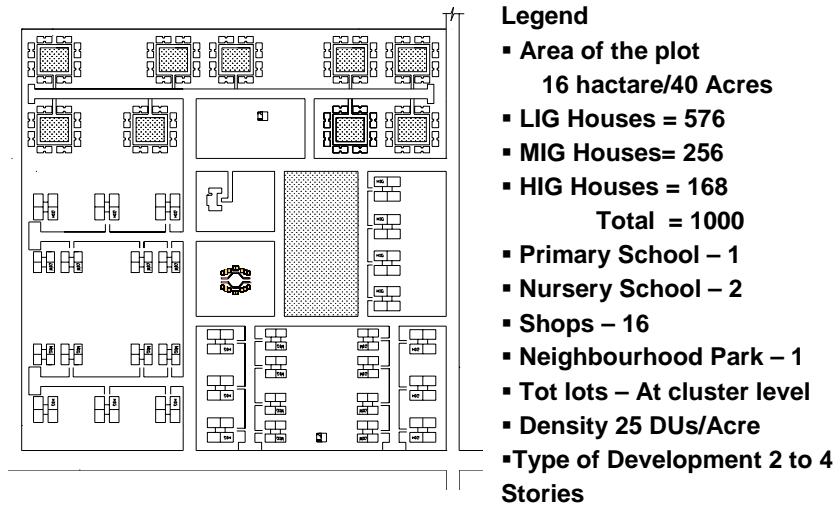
Settlement layout plan for a neighborhood of 5,000 population, Alternative – I
